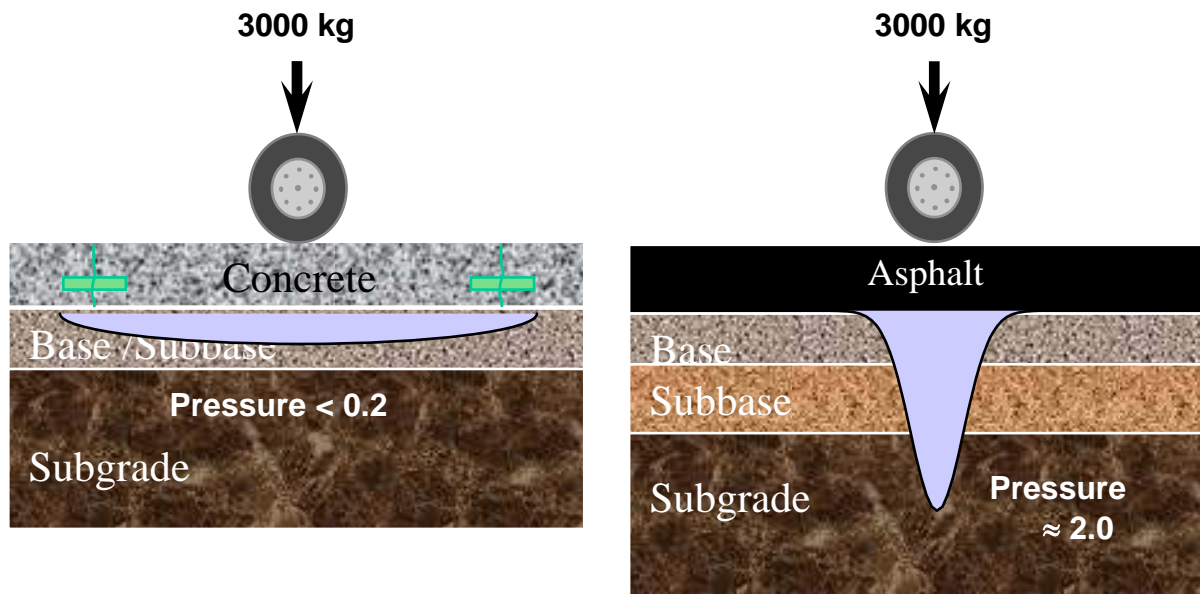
Typical Load Distribution for Flexible and Rigid Pavement Layers [CAC 00]
